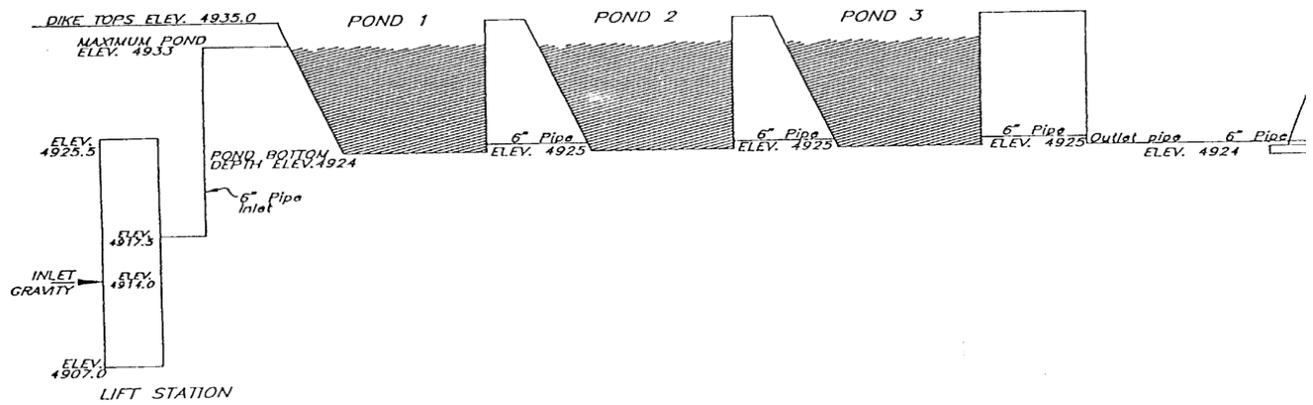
Hydraulic profile of the Central Facilities Area Sewage Treatment Plant.
